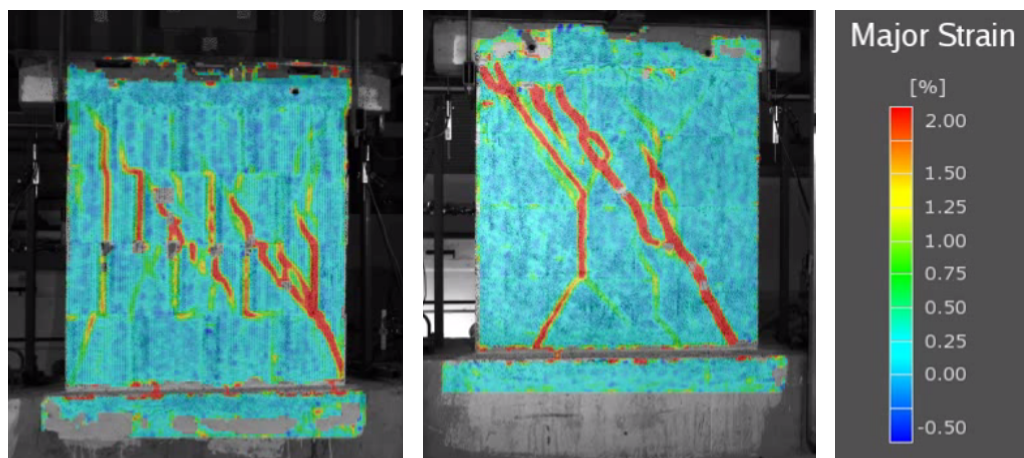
Plot of major strain: a) Wall B-g-20; b) Wall ACC-t-30
